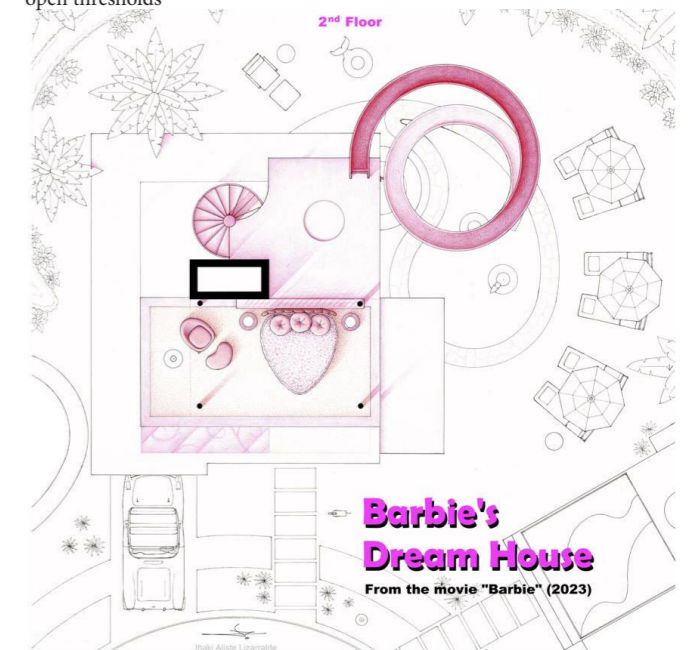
Barbie's Dreamhouse second floor plan with minimal interior walls and open thresholds
